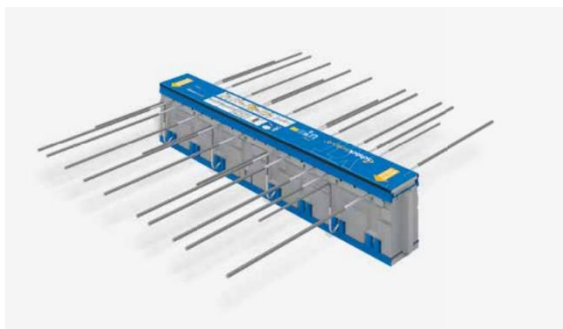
Schöck Isokorb® XT for reinforced concrete structures
